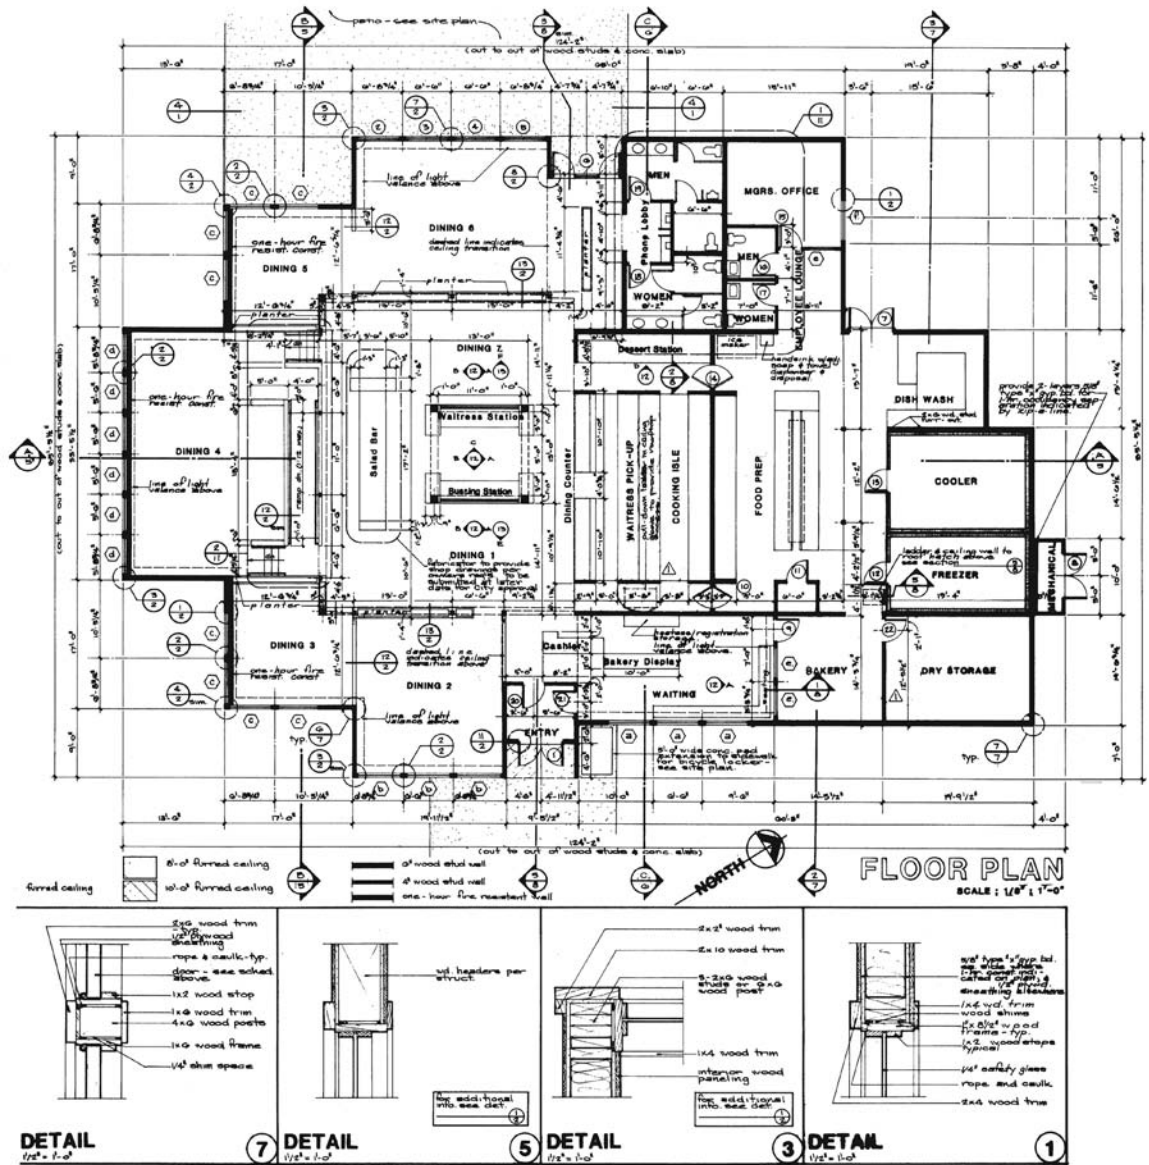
Floor plan and details from a partial set of construction drawings for a restaurant
